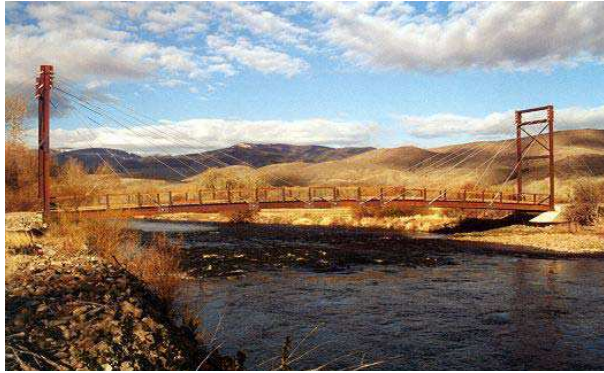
Meriwether Bridge (Sahale Bridge and Anderson Engineering)
